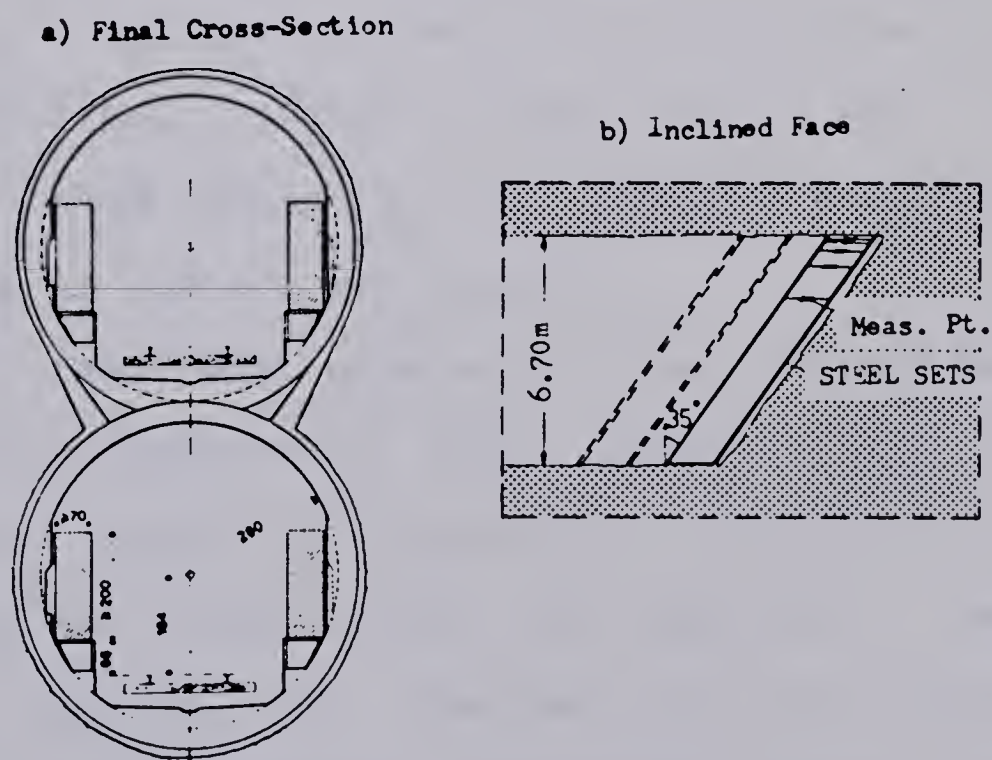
Construction details – Frankfurt Baulos 17/18a (after Krimmer, 1976:modified)
